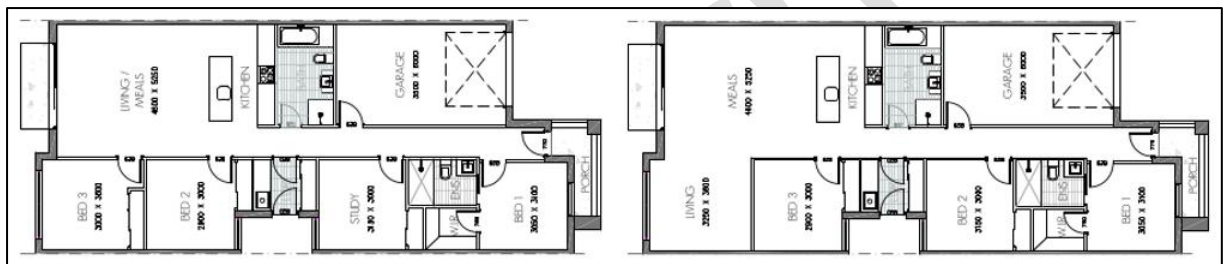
Layout B Units floor plan (left) and Layout B1 Units floor plan (right). Source: Application documents.
